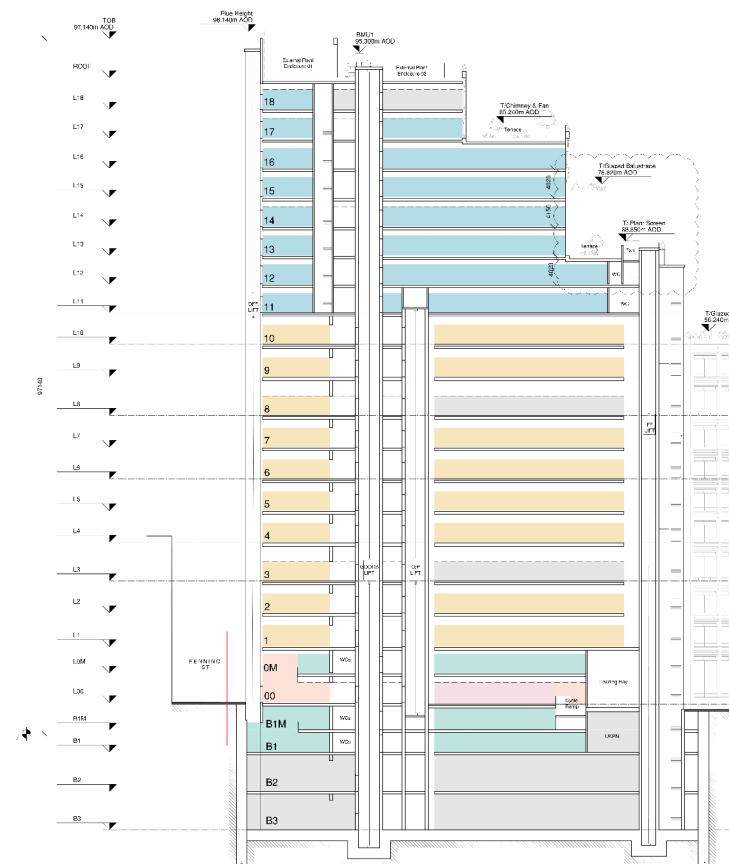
Section of the proposed Vinegar Yard development and internal use
